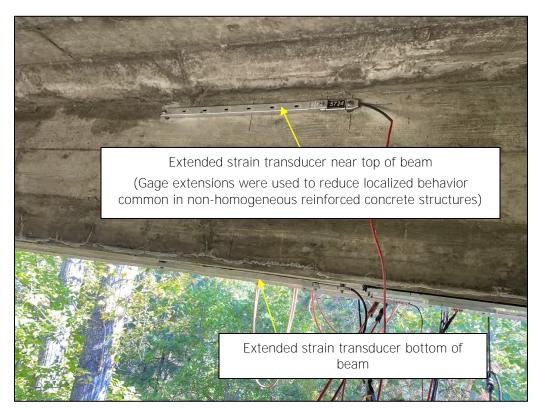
Strain transducers along WA approach span concrete beams (typical)
